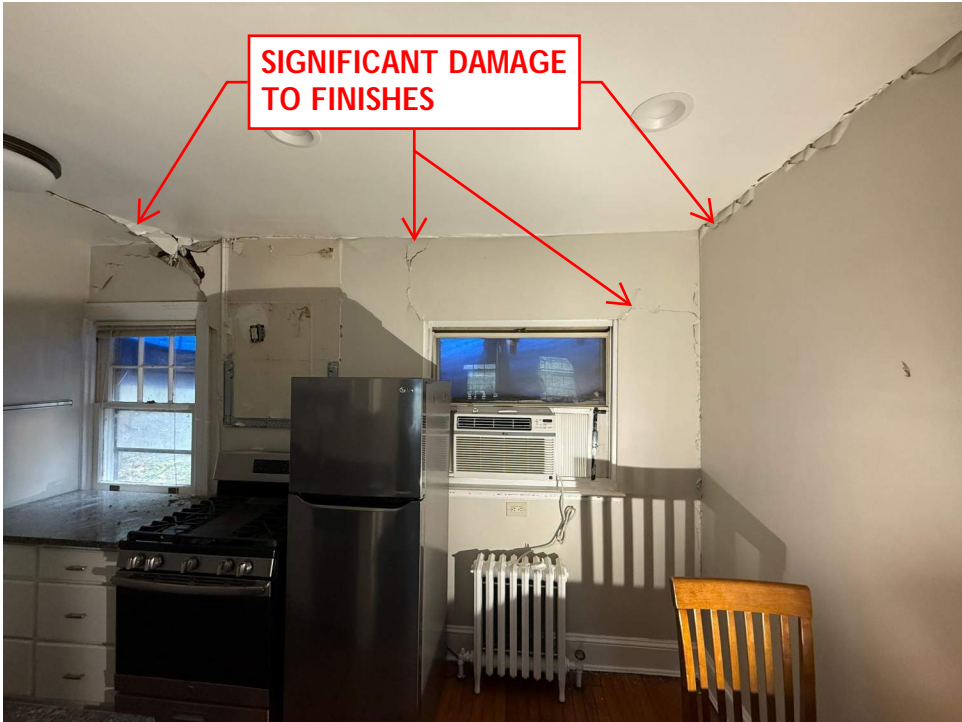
DAMAGED WALLS AND CEILING FINISHES (UNIT 4)
